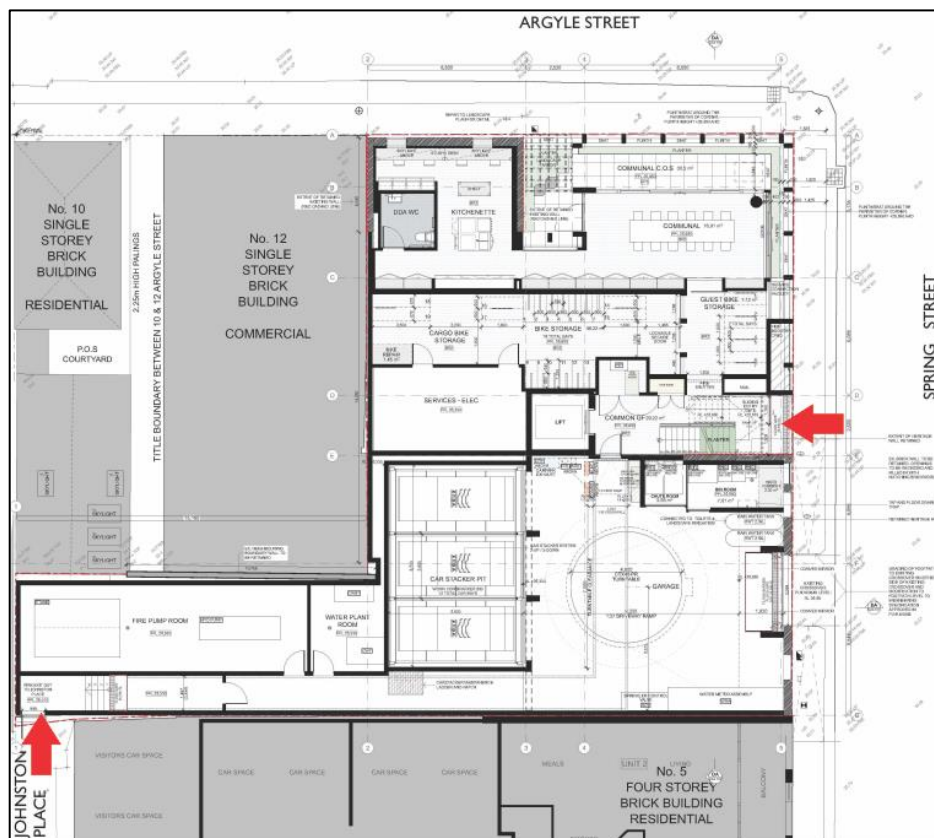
Ground Floor Plan (entrances highlighted by red arrows)
